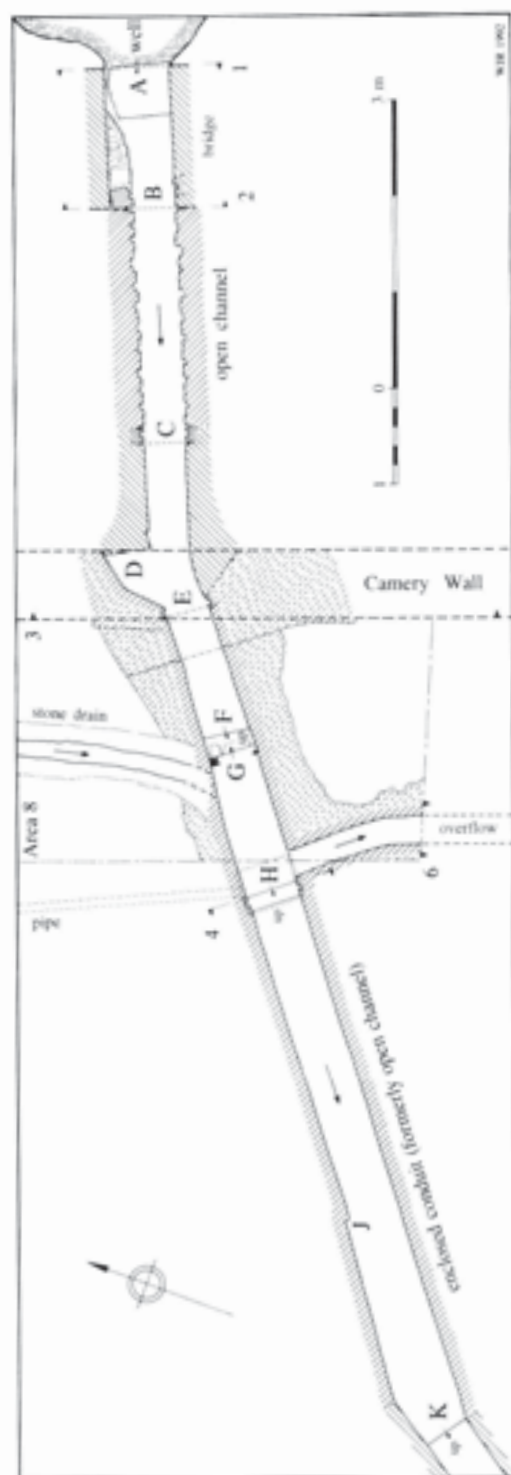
Outline plan, at floor level, of the fifteenth-century and later sections of conduit adjacent to the Camery wall. Long arrows indicate the direction of flow; short arrows mark upward steps in the floor. For sections, see Fig. 401. Scale 1:80
